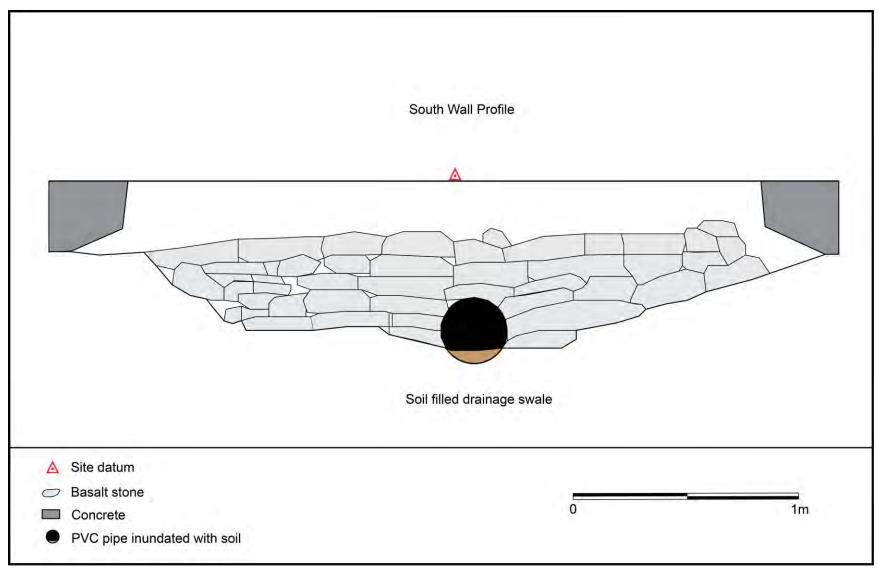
Wall profile of Site 50-30-06-XXXXX (TS-001), Feature 1, basalt retaining wall (view to south).
